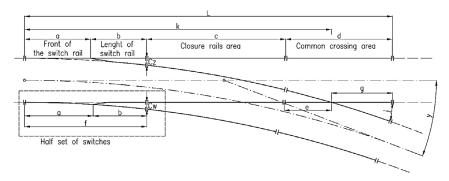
Geometric layout of the turnout type 60E1-500-1:12
